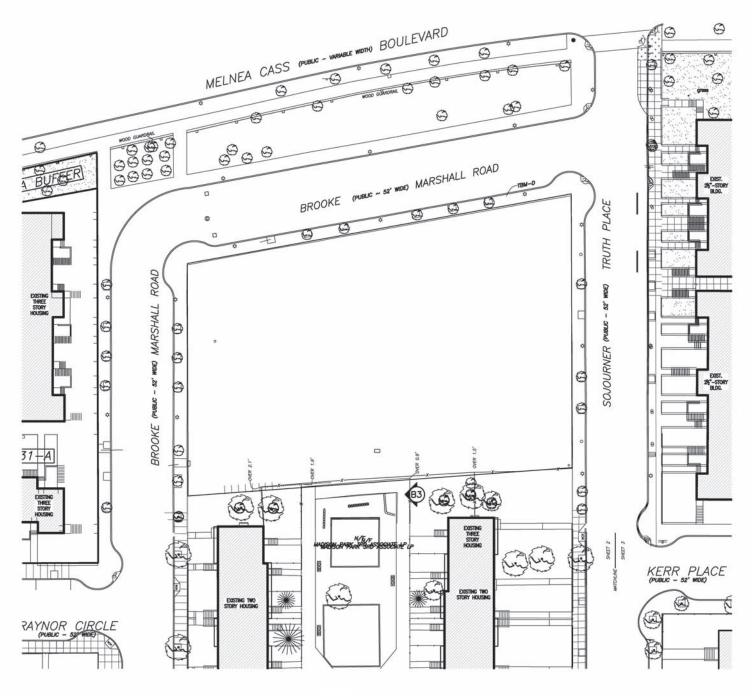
EXISTING SITE 2B SITE PLAN
